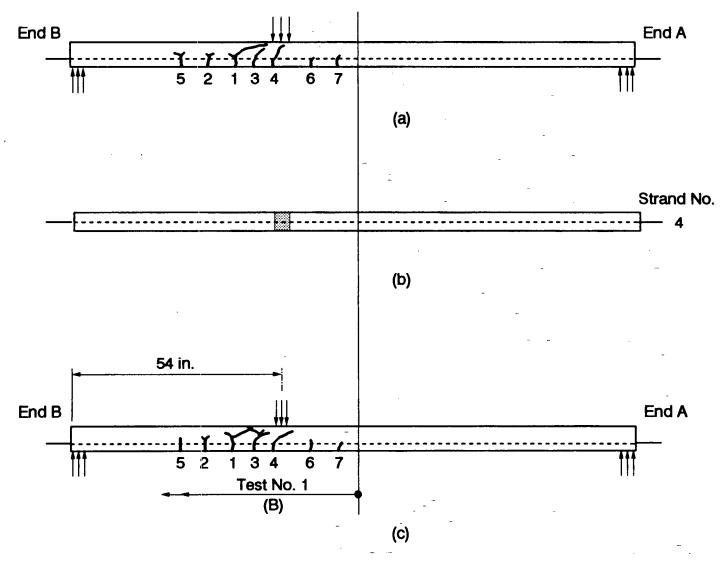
Crack pattern for D-type Specimen No. 10-6.0DU-4:
